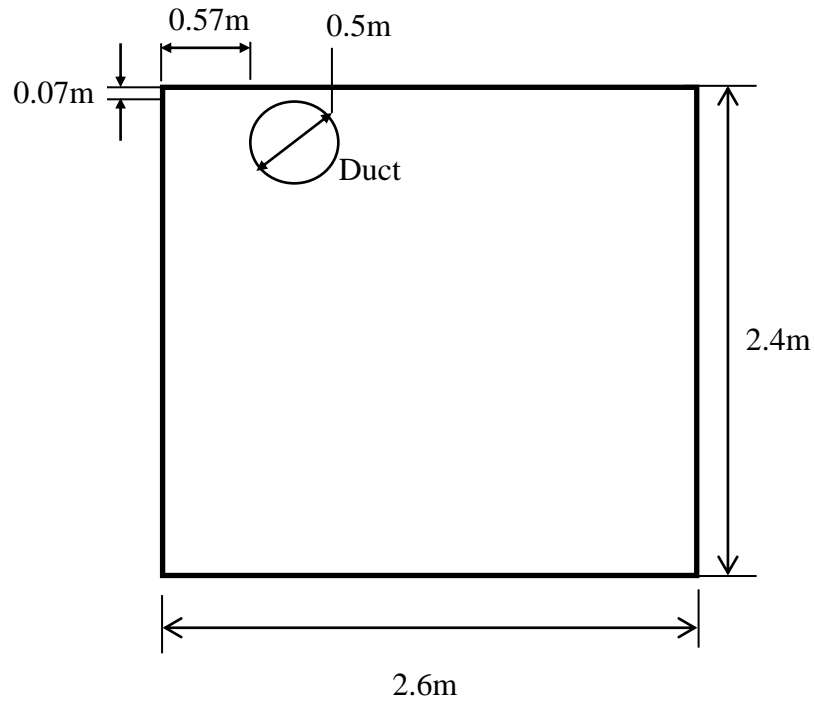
Dimension of the tunnel face and duct distances from the walls of tunnel
